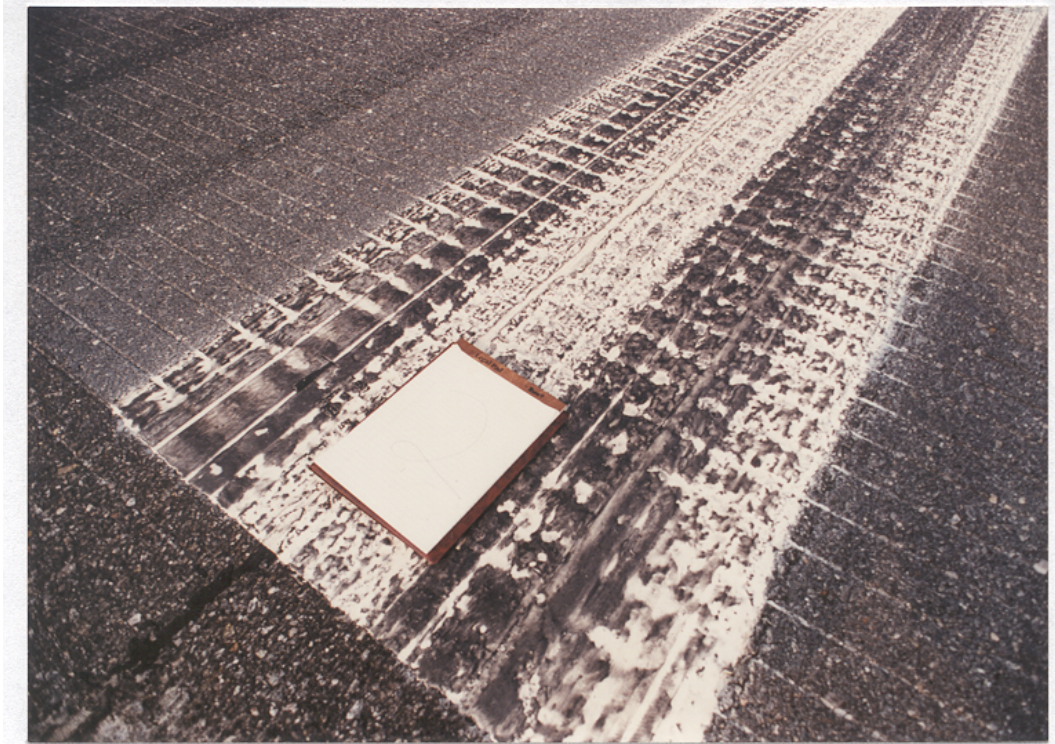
RUBBER ACCUMULATION ON RUNWAY TEST STRIPE
